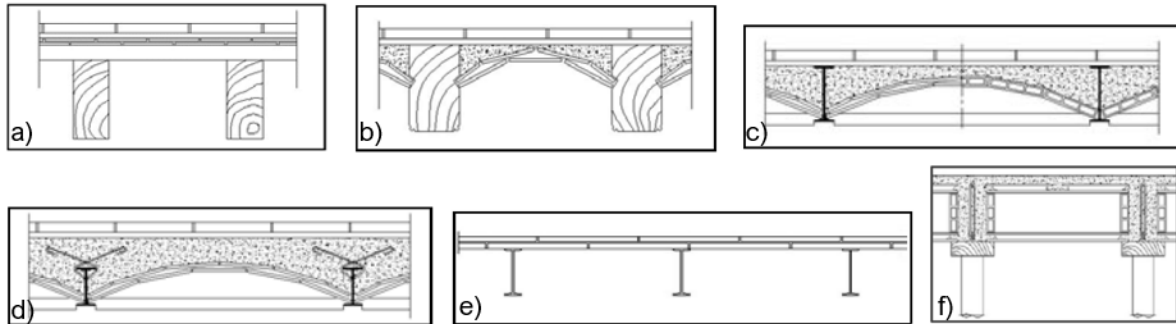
Different floor slab solutions during the construction periods of the *Eixample* buildings (Paricio Casademunt, 2001): a) timber beams connected with wood planks; b) timber beams with ceramic tile vaults; c) steel beams with ceramic tile vaults; d) metallic profile with concrete addition through round connectors; e) metal beams connected with a pavement of double row ceramic tiles; f) ceramic reinforced floor slab.
